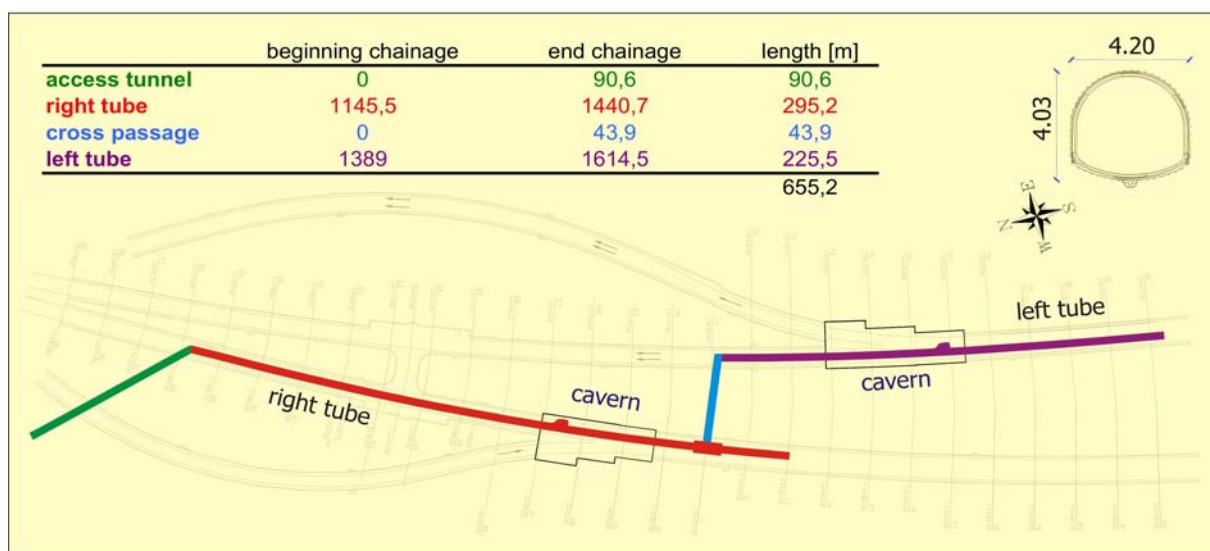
Executed alignment and cross section of the exploratory tunnel.
